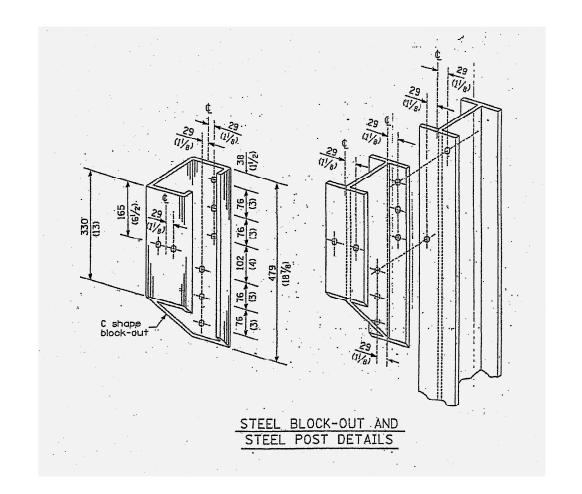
DETAIL THREE BEAM GUARDRAIL WITH MODIFIED OFFSET BLOCK OF SHEETS STA.
